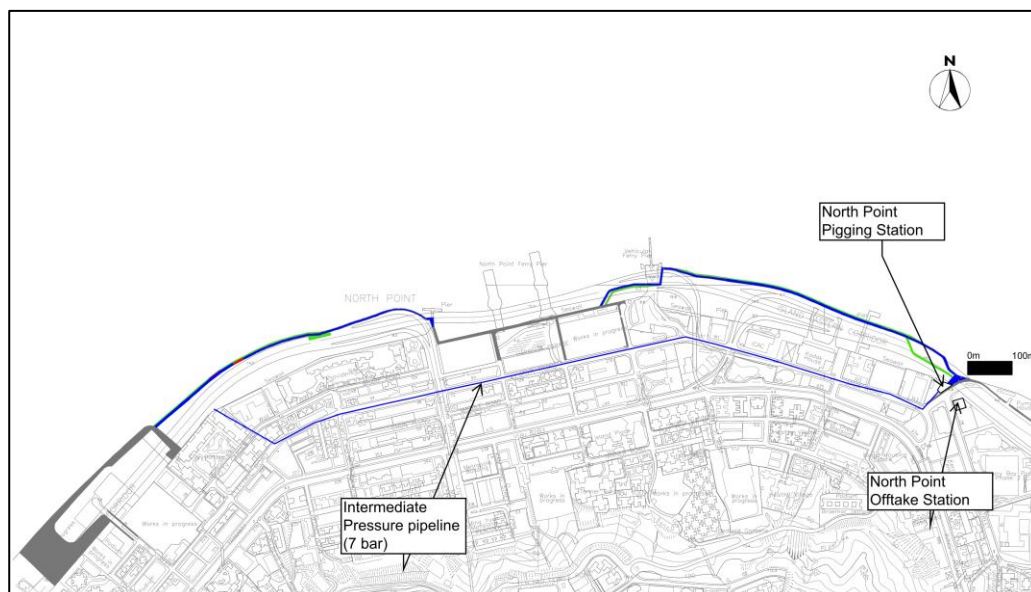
Locations of the Town Gas Facilities and Associated Pipeworks
